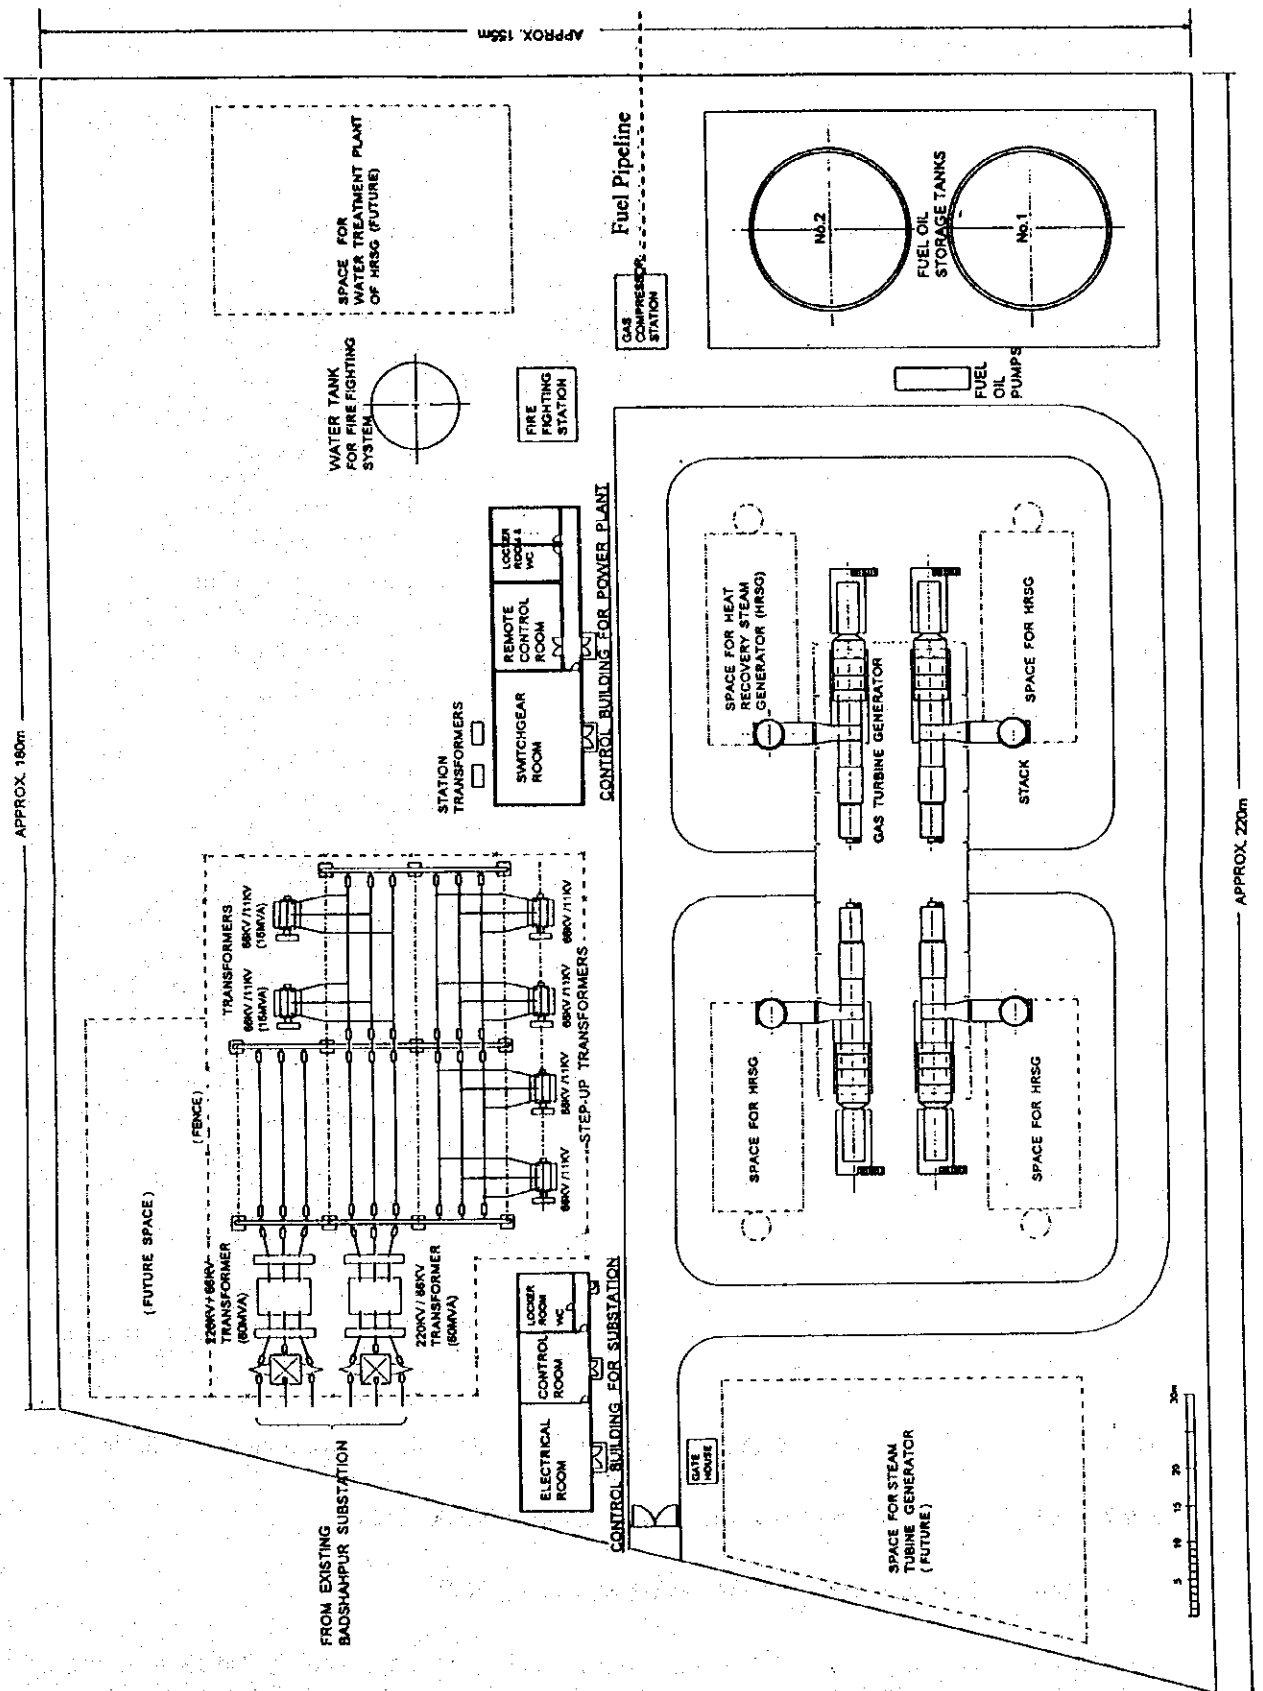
Plot Plan of the IMT Power Plant and Main Substation
